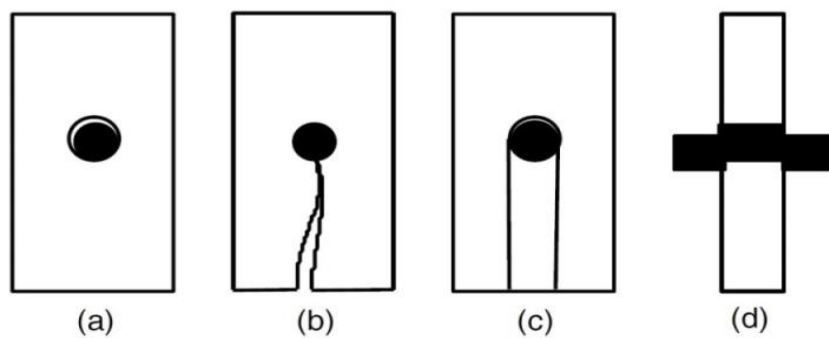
13. Dowel laminated timber possible failures (a)bearing, (b) splitting, (c) shearing out, (d) fastener⁴⁹
